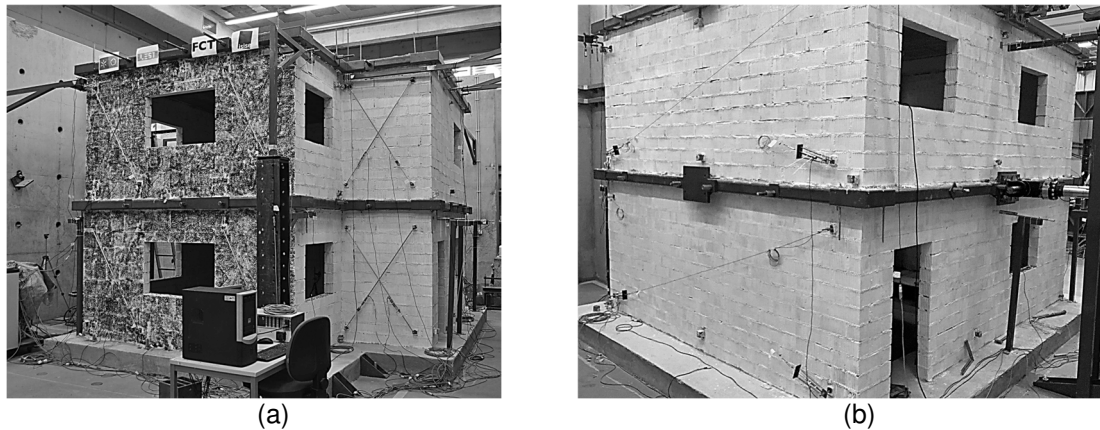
The half-scale experimental building, (a) North-West façade, (b) South-East façade.
